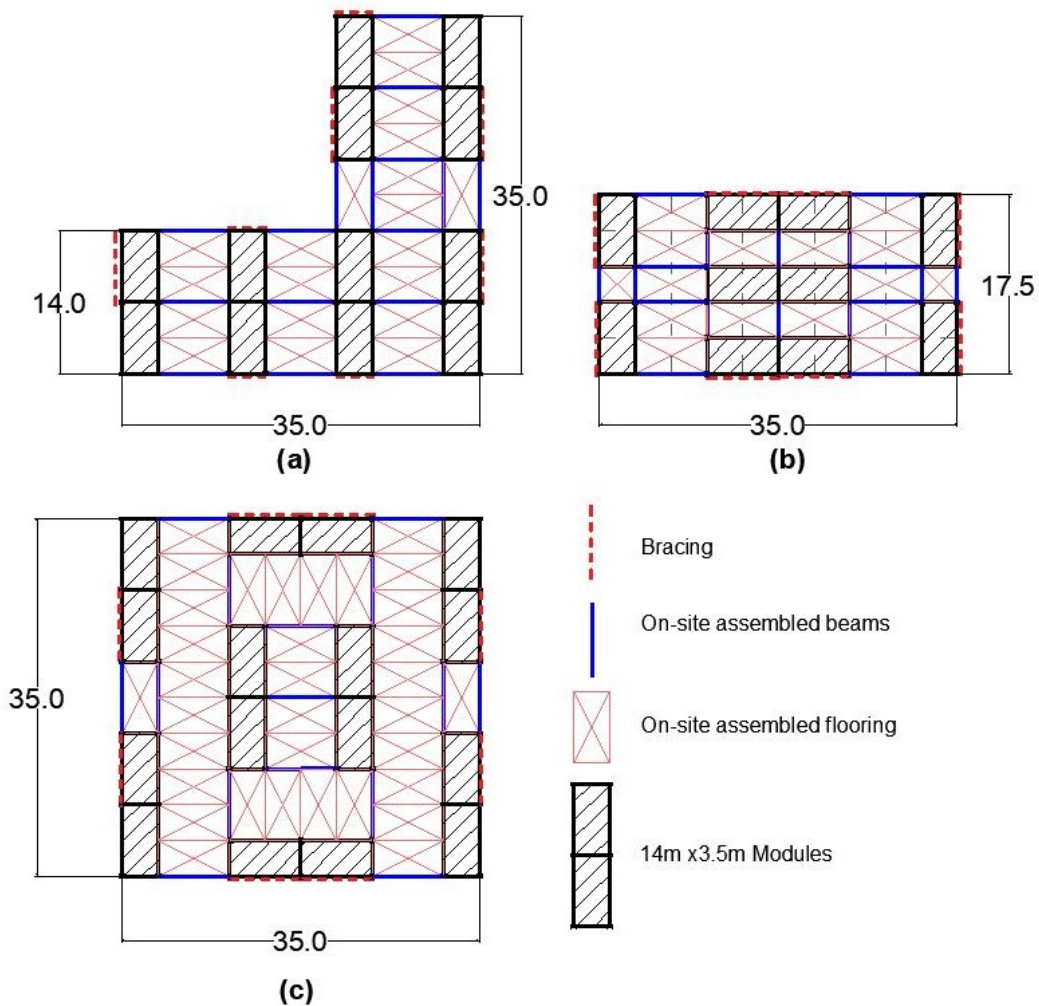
Module layouts forming various building geometries (dimensions in m)
